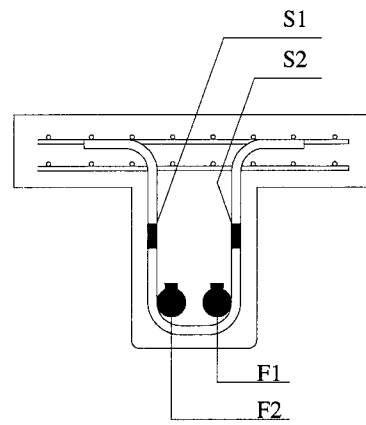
Elevation view of beam B-2 after installing the mechanical anchor
